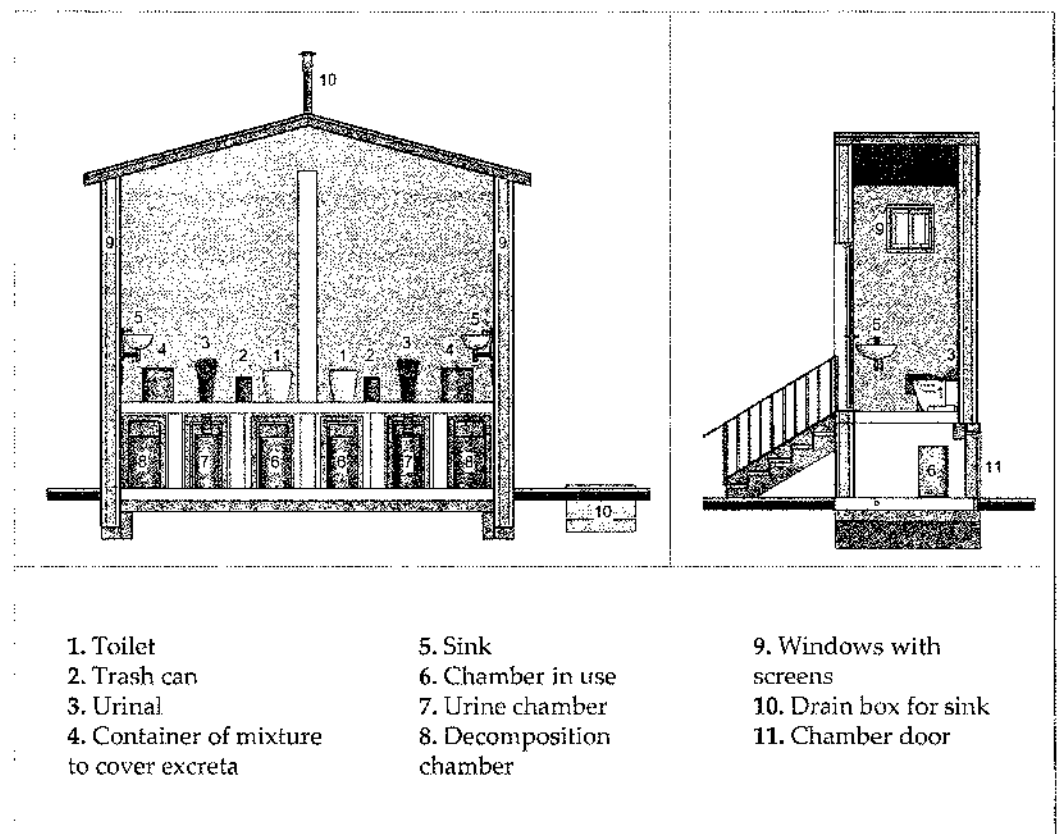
Longitudinal and cross-sectional view of double dry bath.
